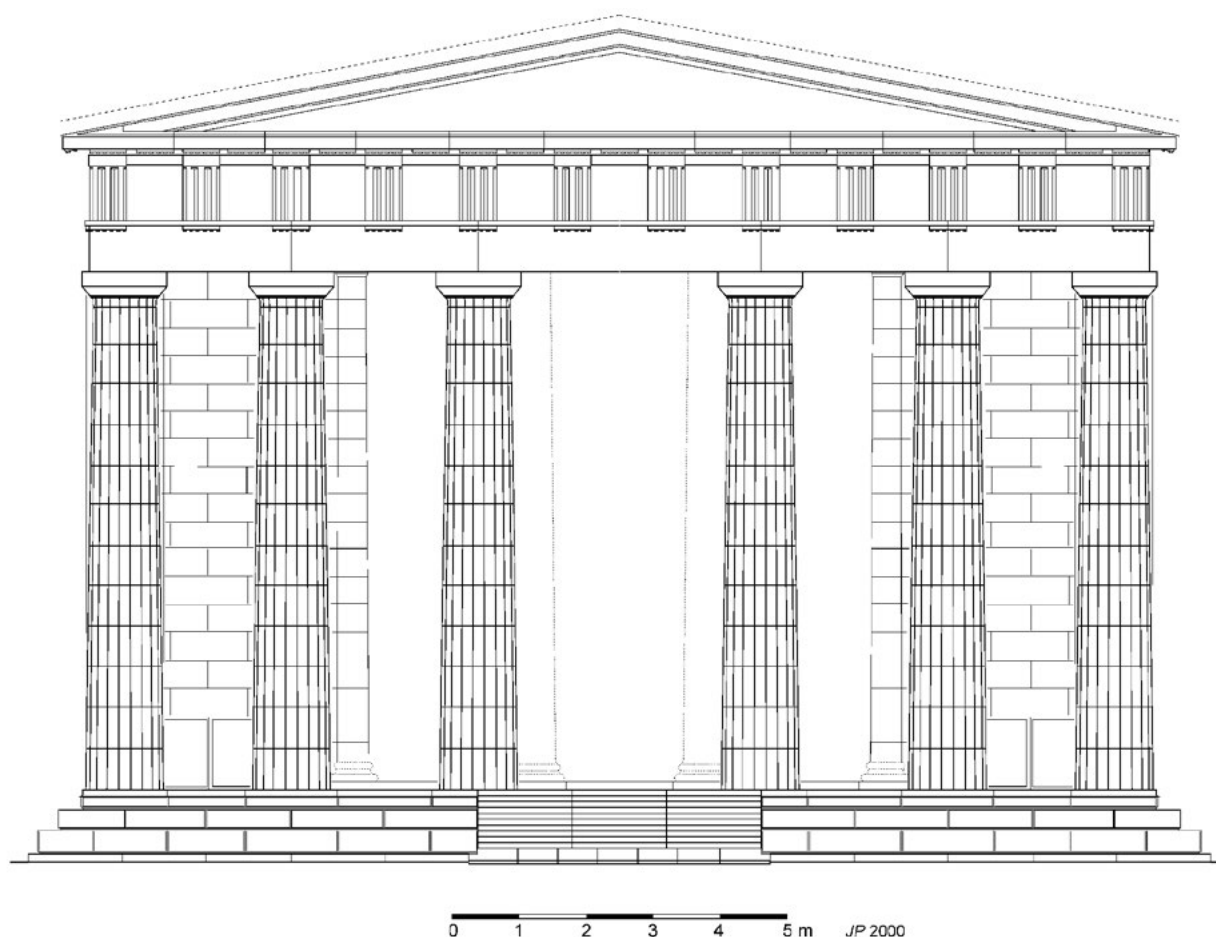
Hestiatorion*, Epidauros. Reconstruction of the Propylon façade with 12-drum columns (drawing: Jari Pakkanen).
